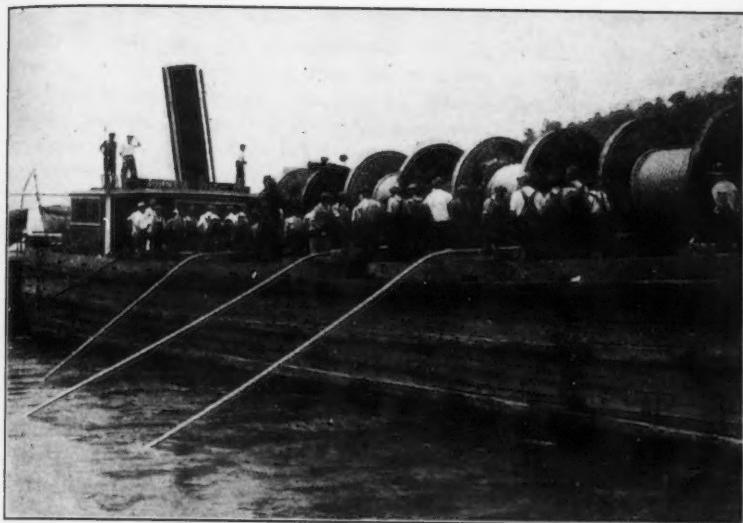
LAYING FOOTBRIDGE ROPES IN HUDSON RIVER.
